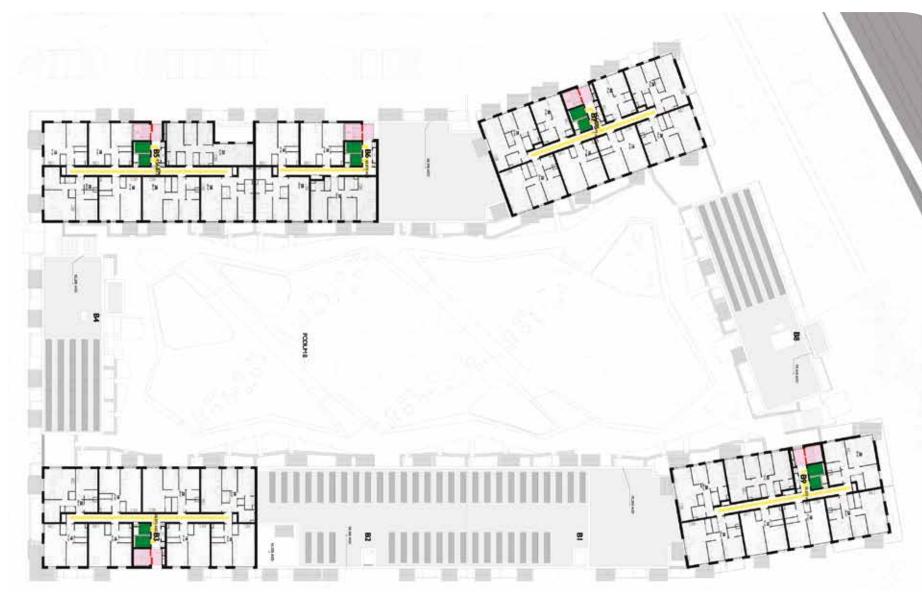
Block B General Arrangement-Eighth floor
